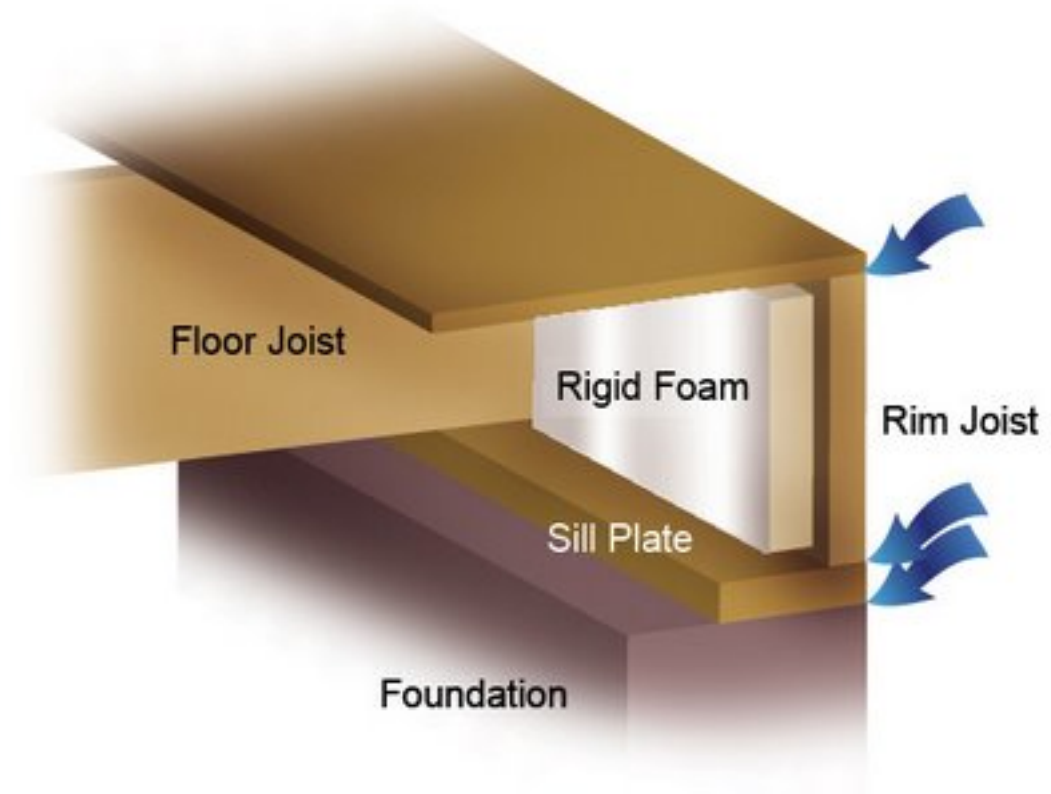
Sill Plate and Floor Joist Typical Air Leakage Entrance Areas
